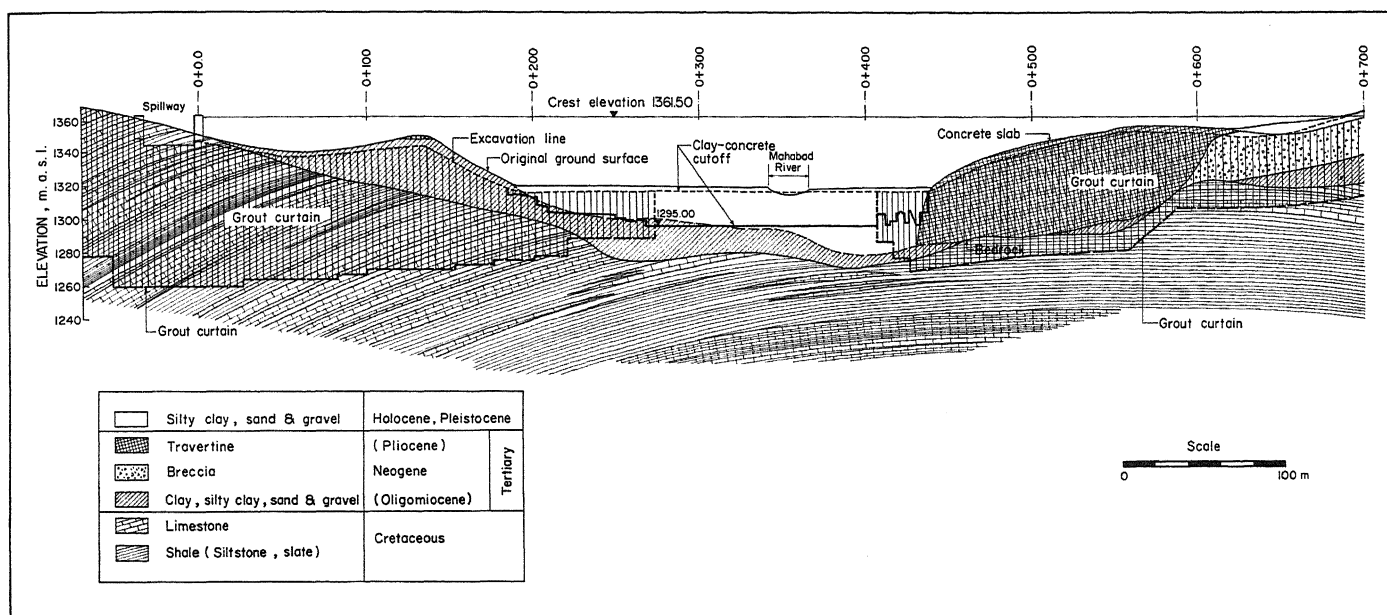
Longitudinal section along dam axis (looking D/S) showing geology, grout curtain and cutoff
